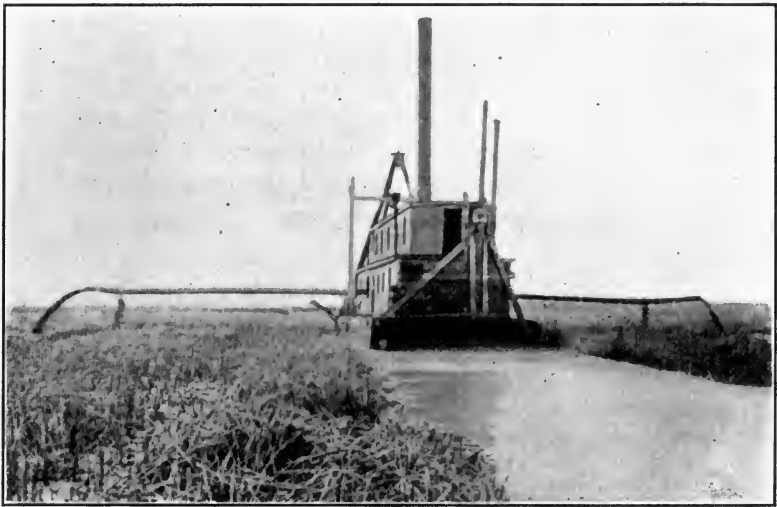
Hydraulic dredge excavating a drainage canal.
